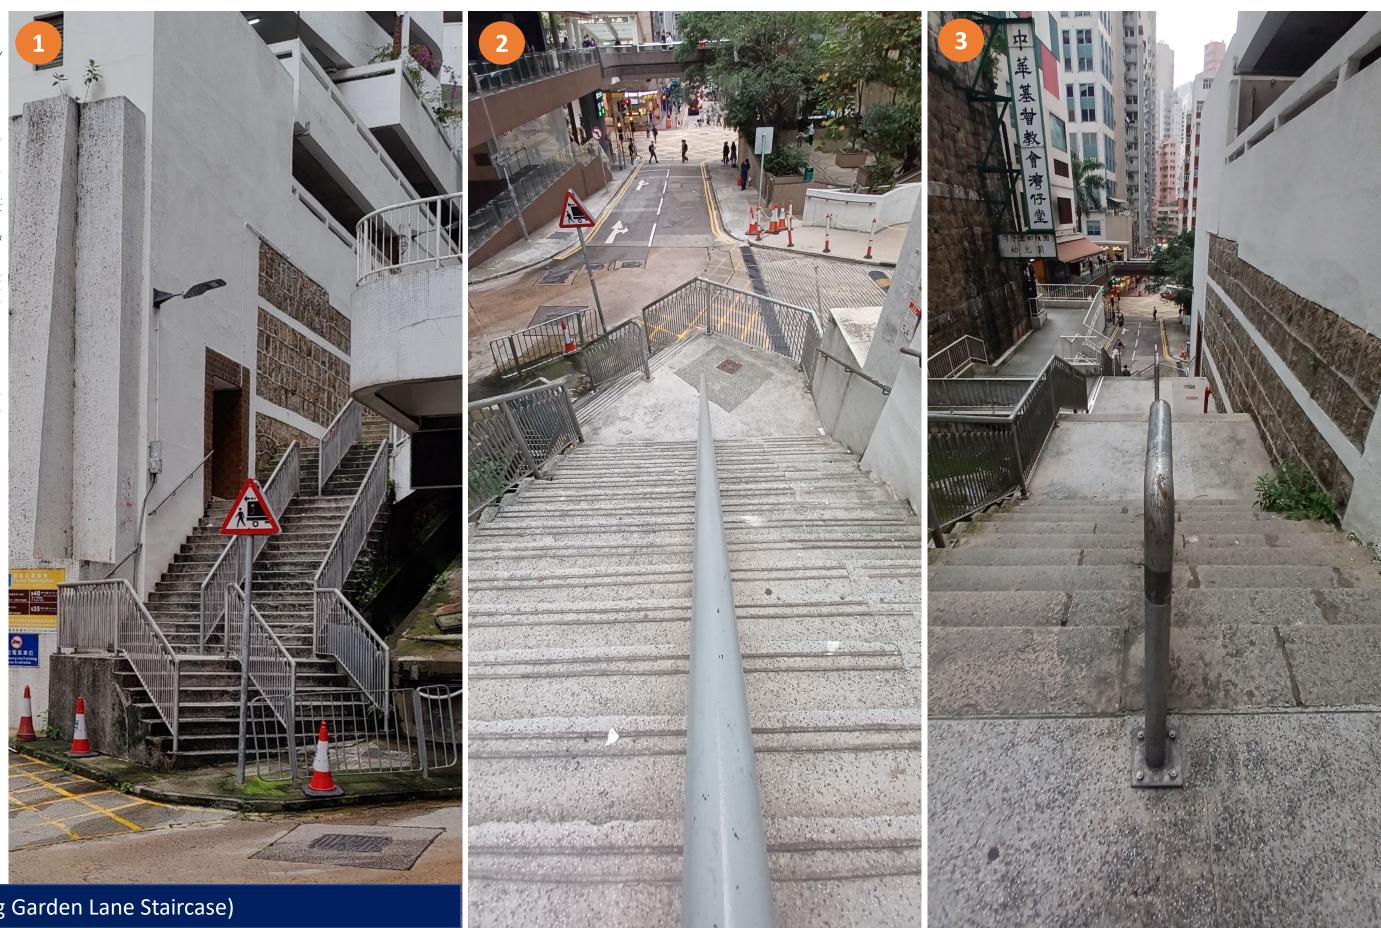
EXISTING SITE CONDITIONS (Spring Garden Lane Staircase)
